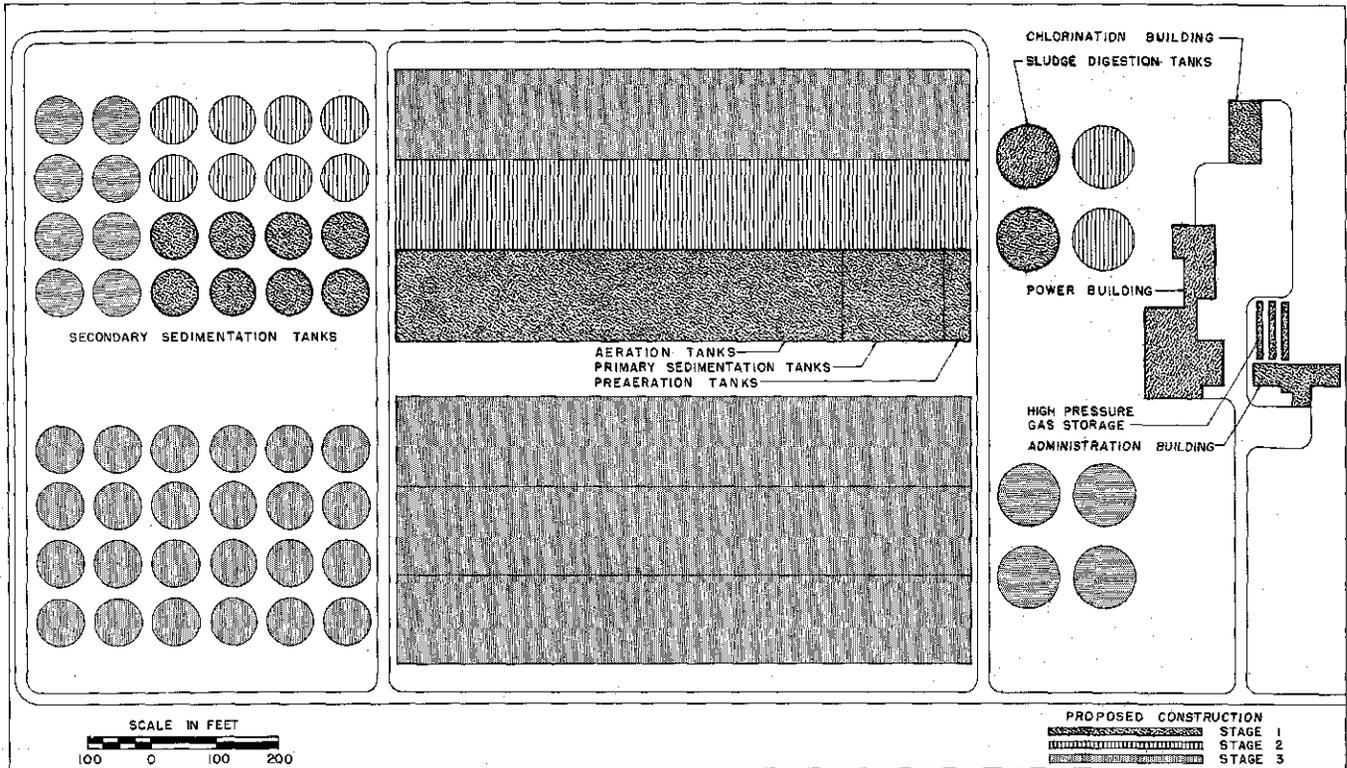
Possible Layout of Sewage Treatment Facilities, Renton Plant
